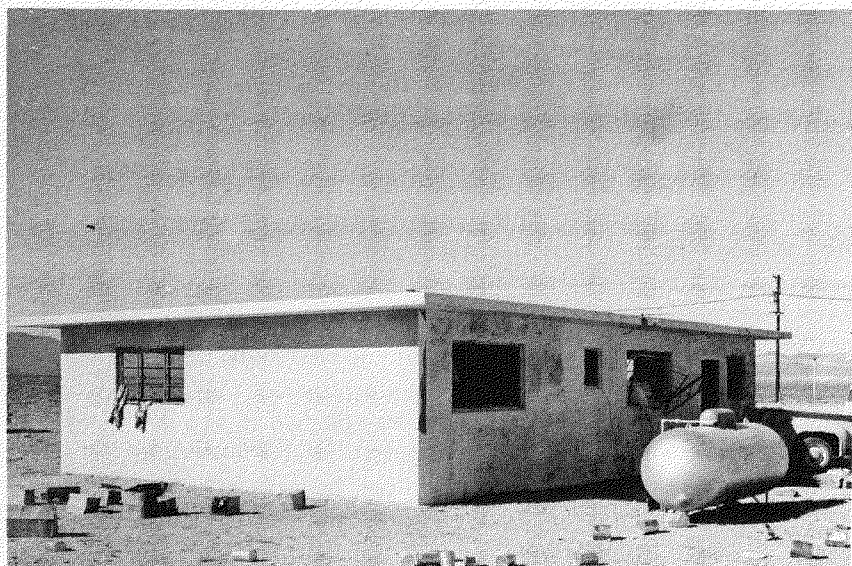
Reinforced precast concrete house after the nuclear explosion (5 psi overpressure). The LP-gas tank, sheltered by the house, is essentially undamaged.
